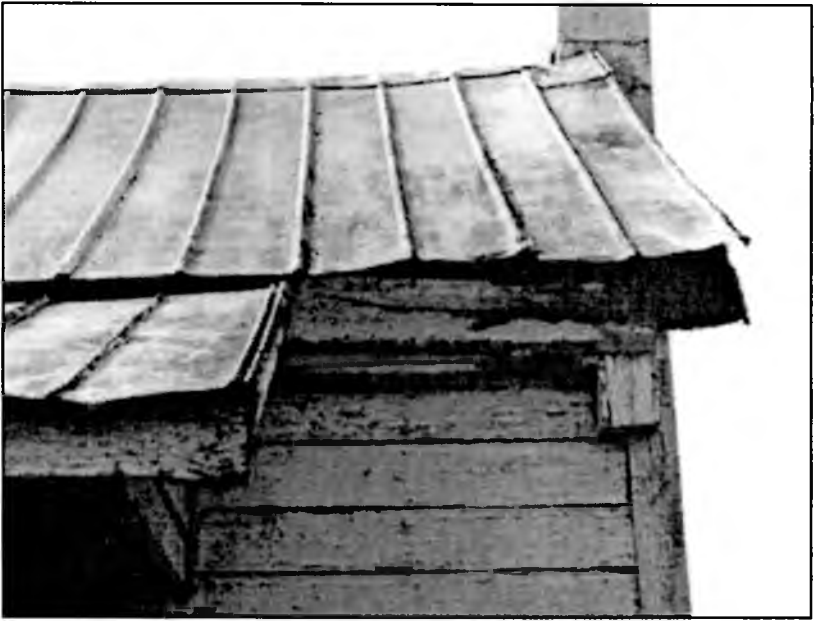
Detail showing beam projecting under soffit, yeoman's house, Upper Hampton Road, Limestone County.
